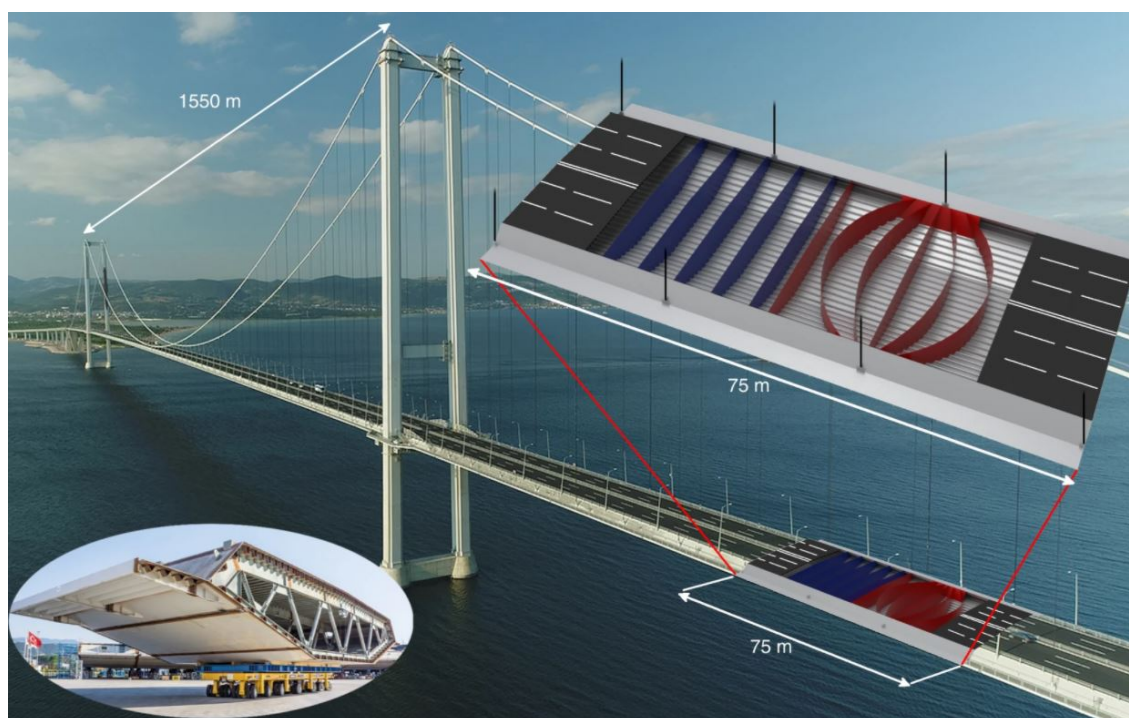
The new design concept for the Ozman Gazi bridge deck as presented in Baandrup et al. [13]. The new curved crossbeams (in red) are compared to the traditional straight crossbeams (in blue). In the bottom left, a photo of a bridge deck section is shown.
